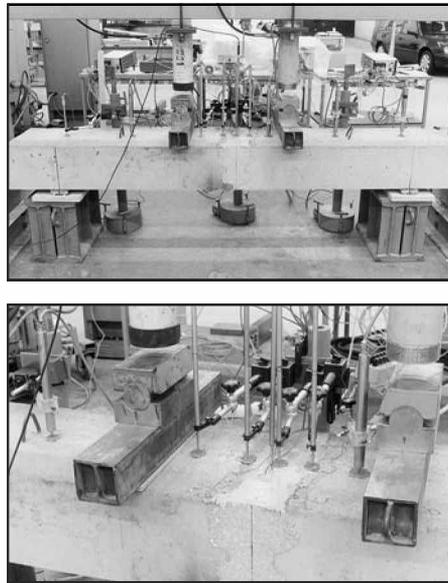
Above is the set-up for static loading test. Loading consists of two symmetric point loads. Specimens span 2000 mm and the space between loading points is 600 mm. Below is a close view of the set-up. Vertical deflection was gauged by displacement transducers and strain gauges were attached to the reinforcing bars to be spliced, one at each side of the interface between the CRC and the ordinary concrete. Essentially the same set-up is used for two of the series in the fatigue test
